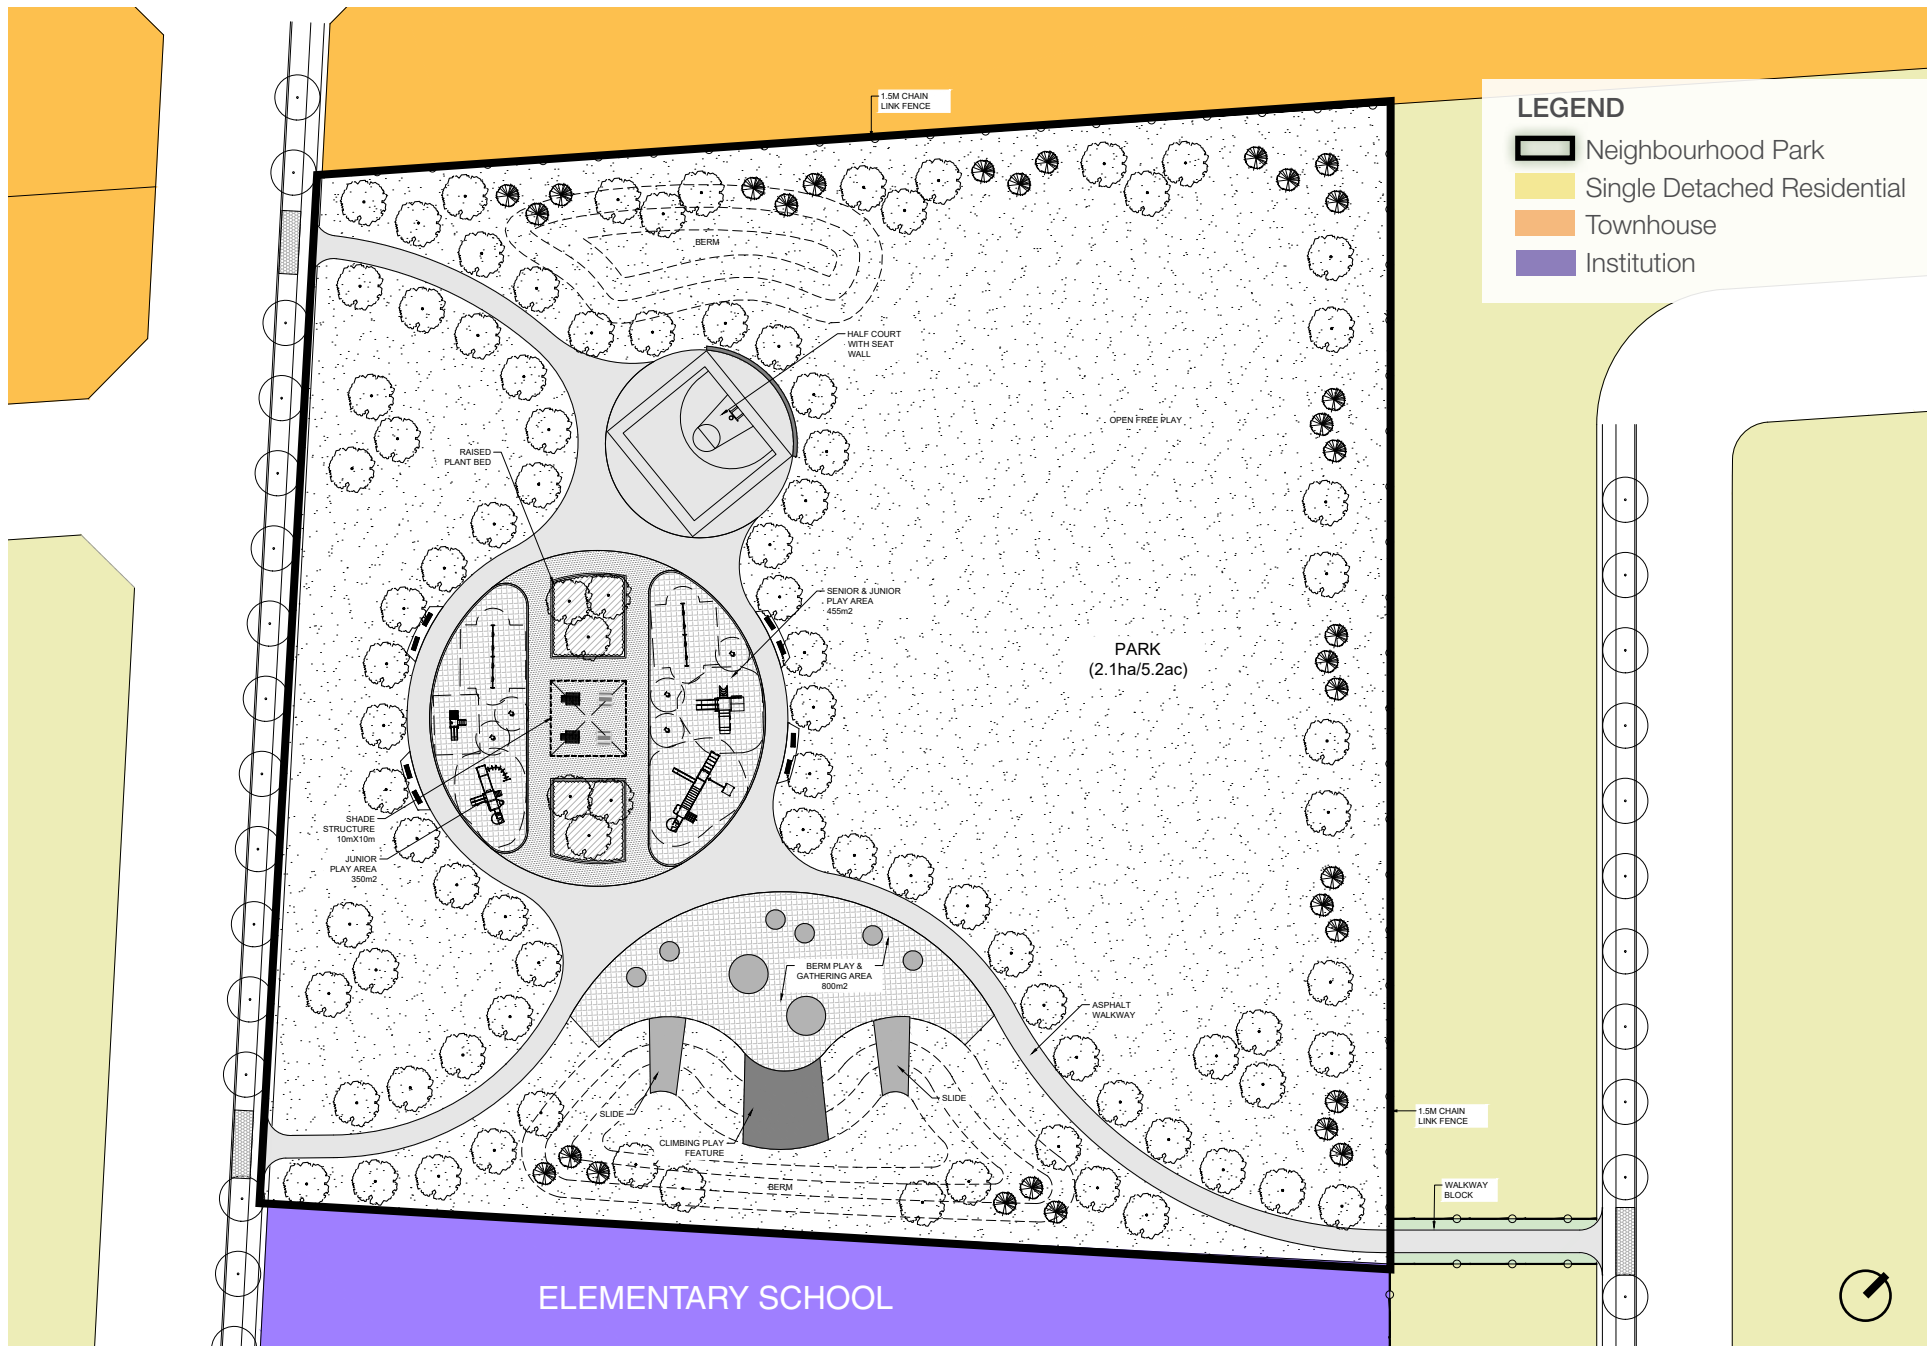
Proposed Neighbourhood Park 1 Facility Fit Plan
